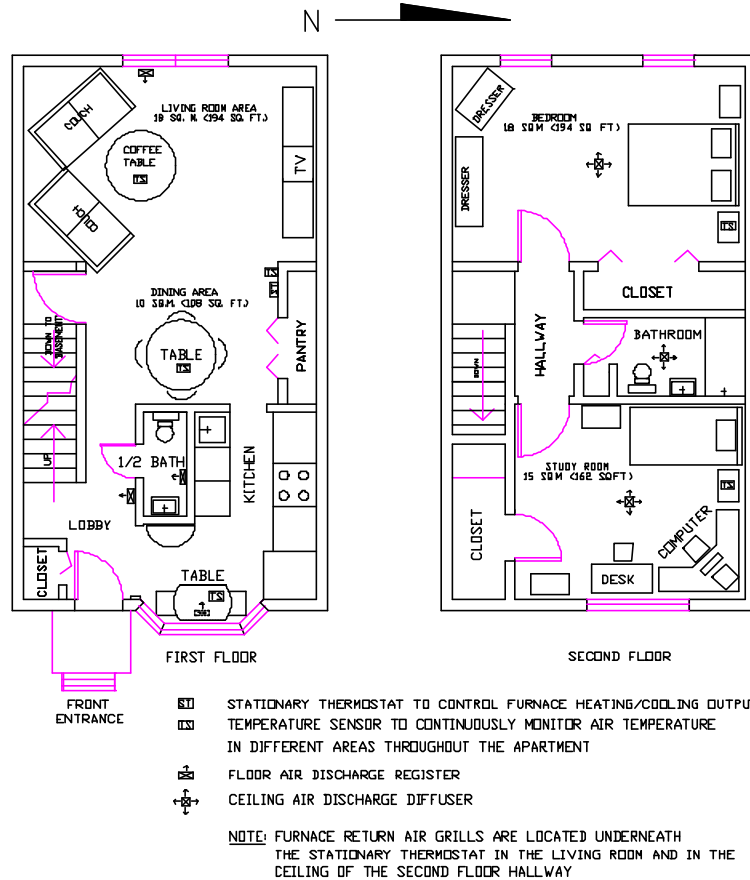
TOWNHOUSE FLOOR PLANS, AIR DISTRIBUTION TERMINALS AND TEMPERATURE SENSORS LOCATION
